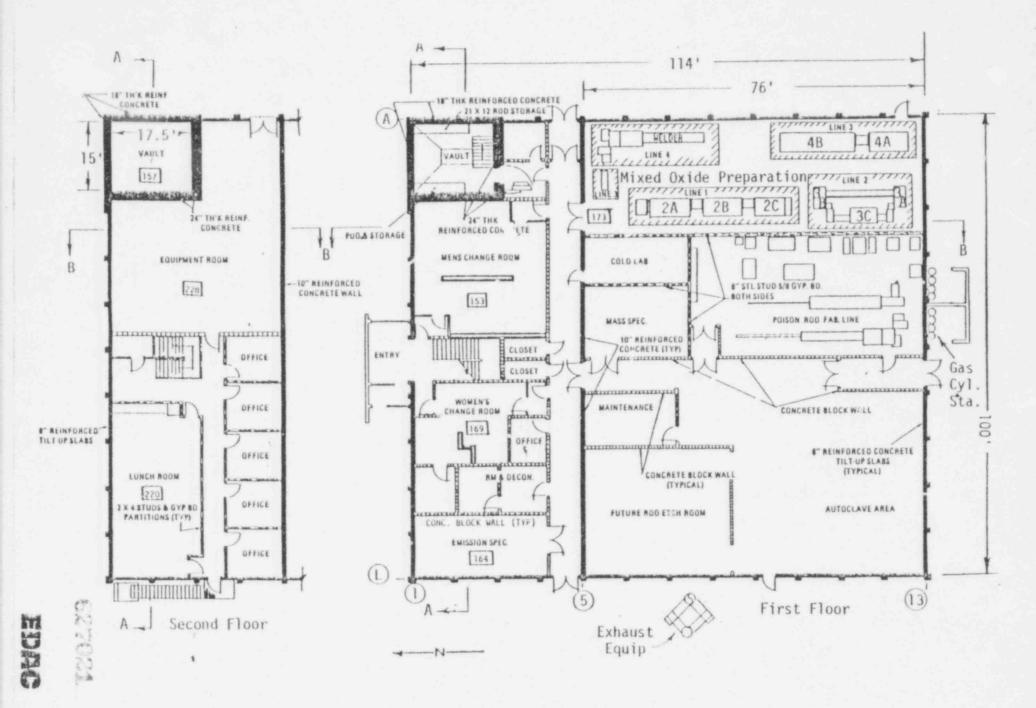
MOFP BUILDING FLOOR PLAN
